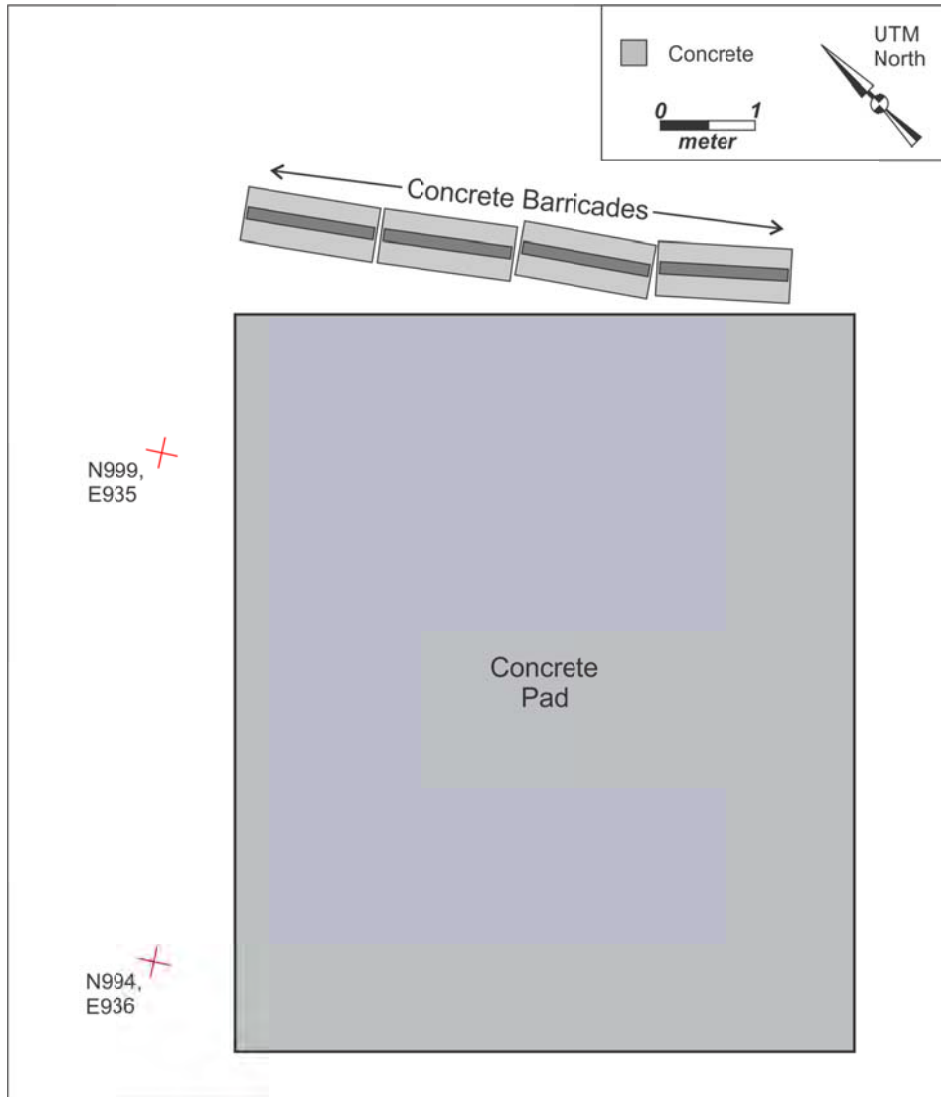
Illustration of garage/outbuilding (Structure #8) foundation at Stockdale Road Dairy.
